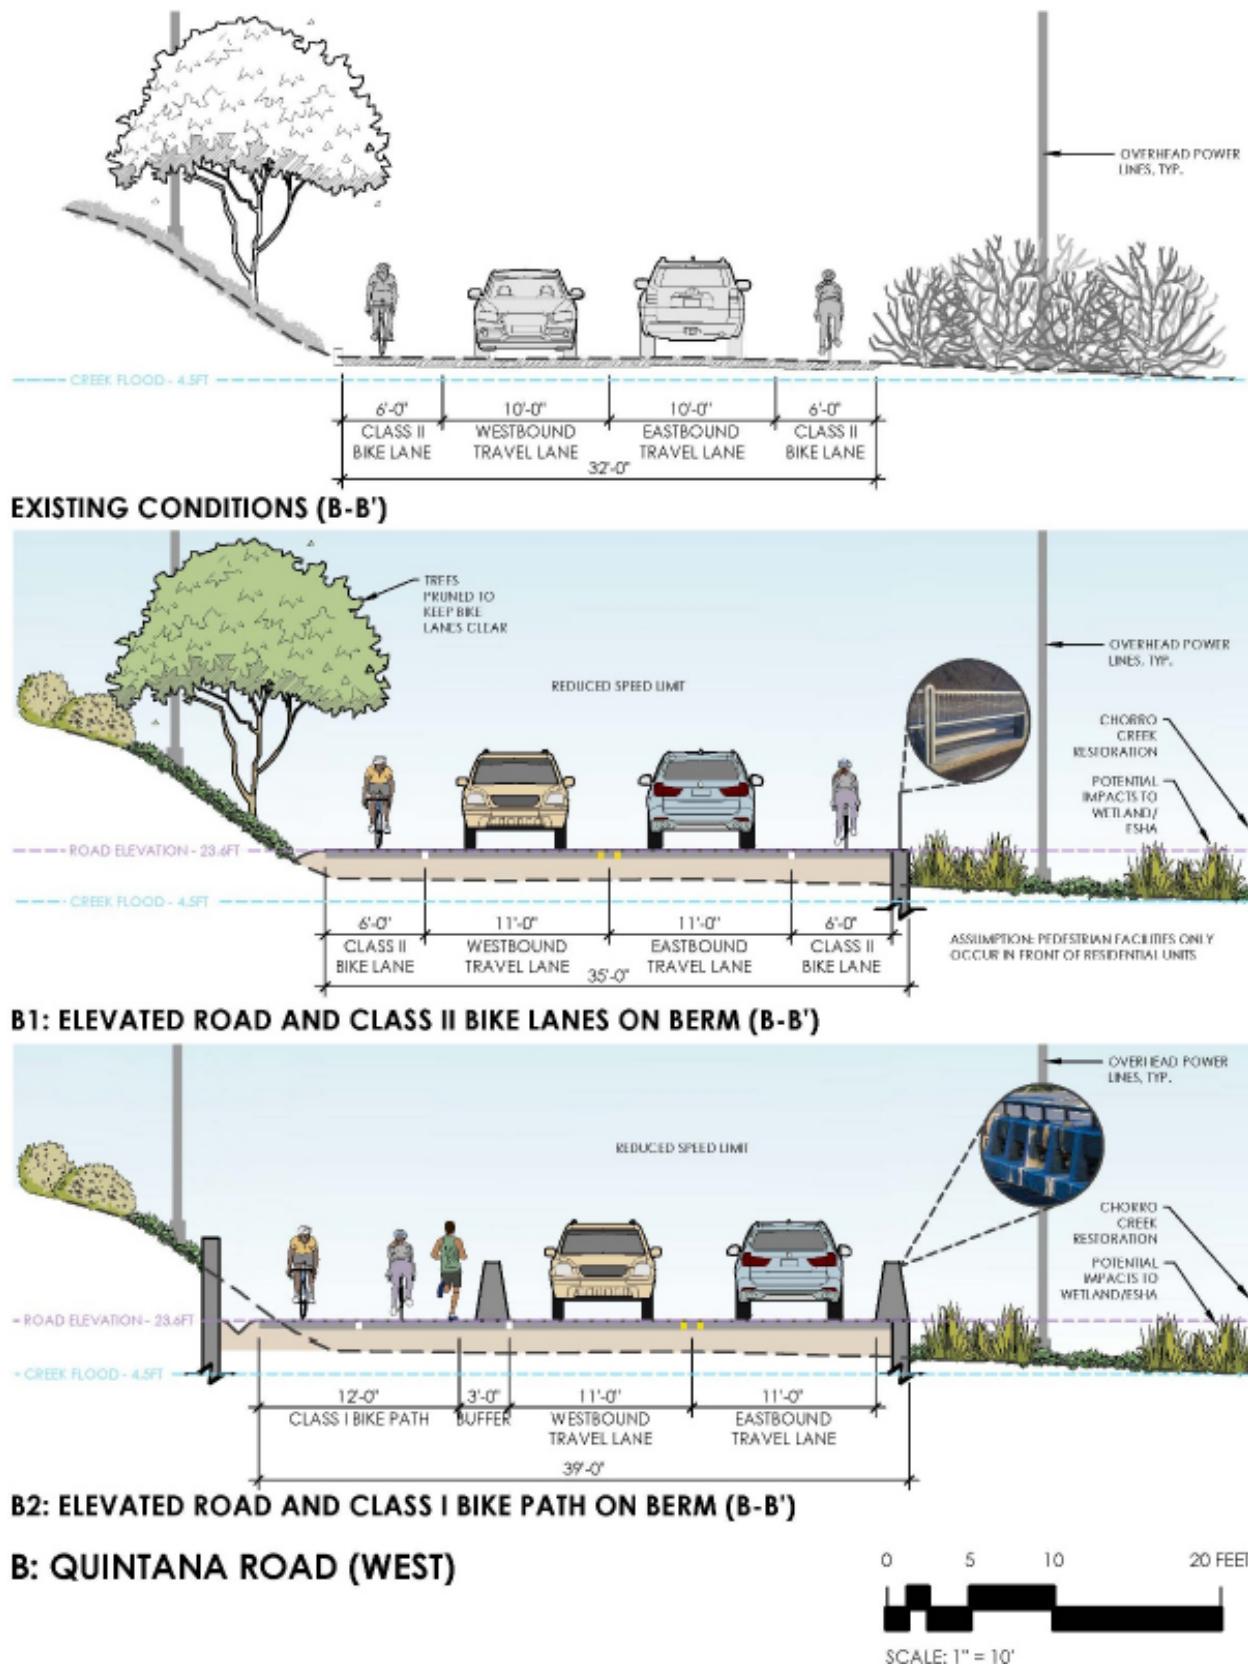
Cross Sections B-B' with Near-term Adaptation Alternatives for Quintana Road
